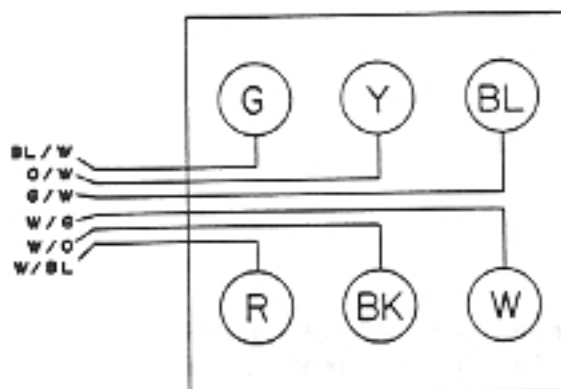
STATION MODULAR JACK ASSEMBLY WIRING
